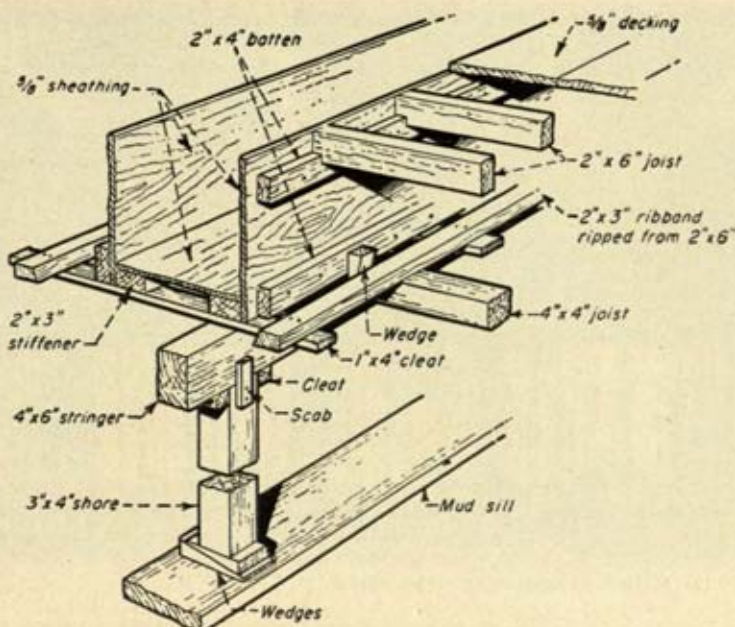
Beam-and-slab forms designed to be used without nails. (*Construction Equipment and Methods.*)
